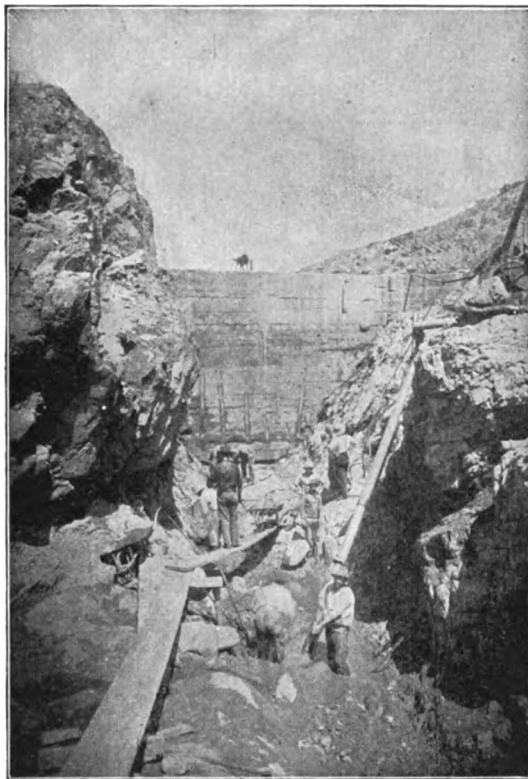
MASONRY FOUNDATION OF LOWER OTAY DAM.
